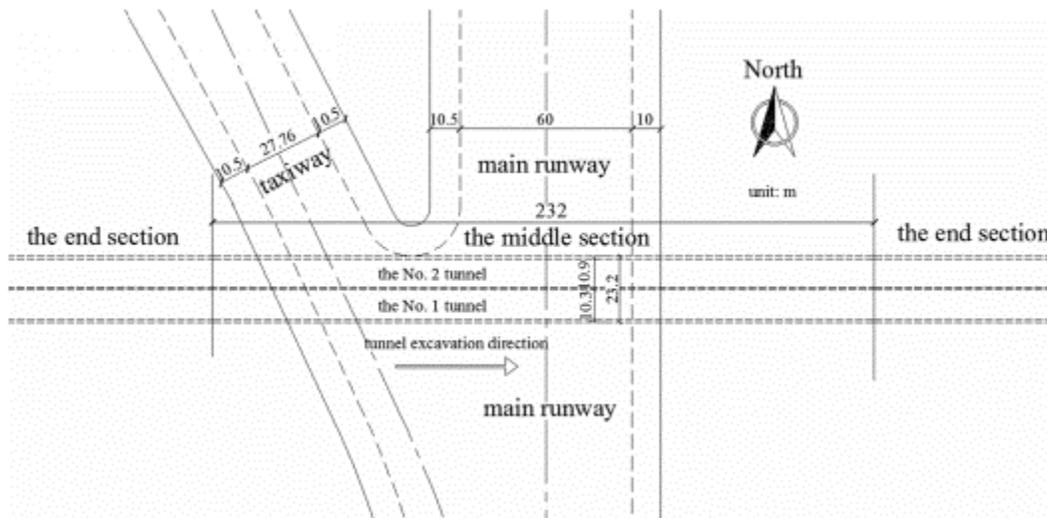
Enlarged Plan of the Tunnel and Runway Sections
